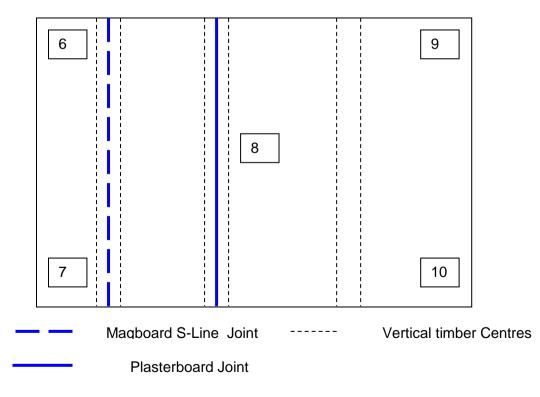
Test Specimen 1 - Pre-test – Non Fire Side
